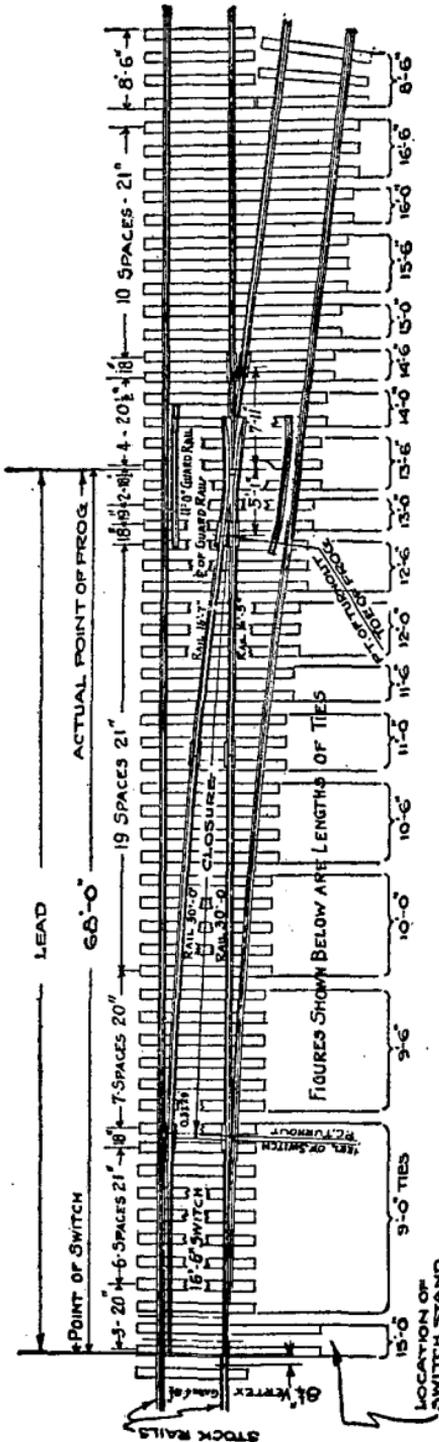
Typical layout of No. 8 turnout standard gauge railway
